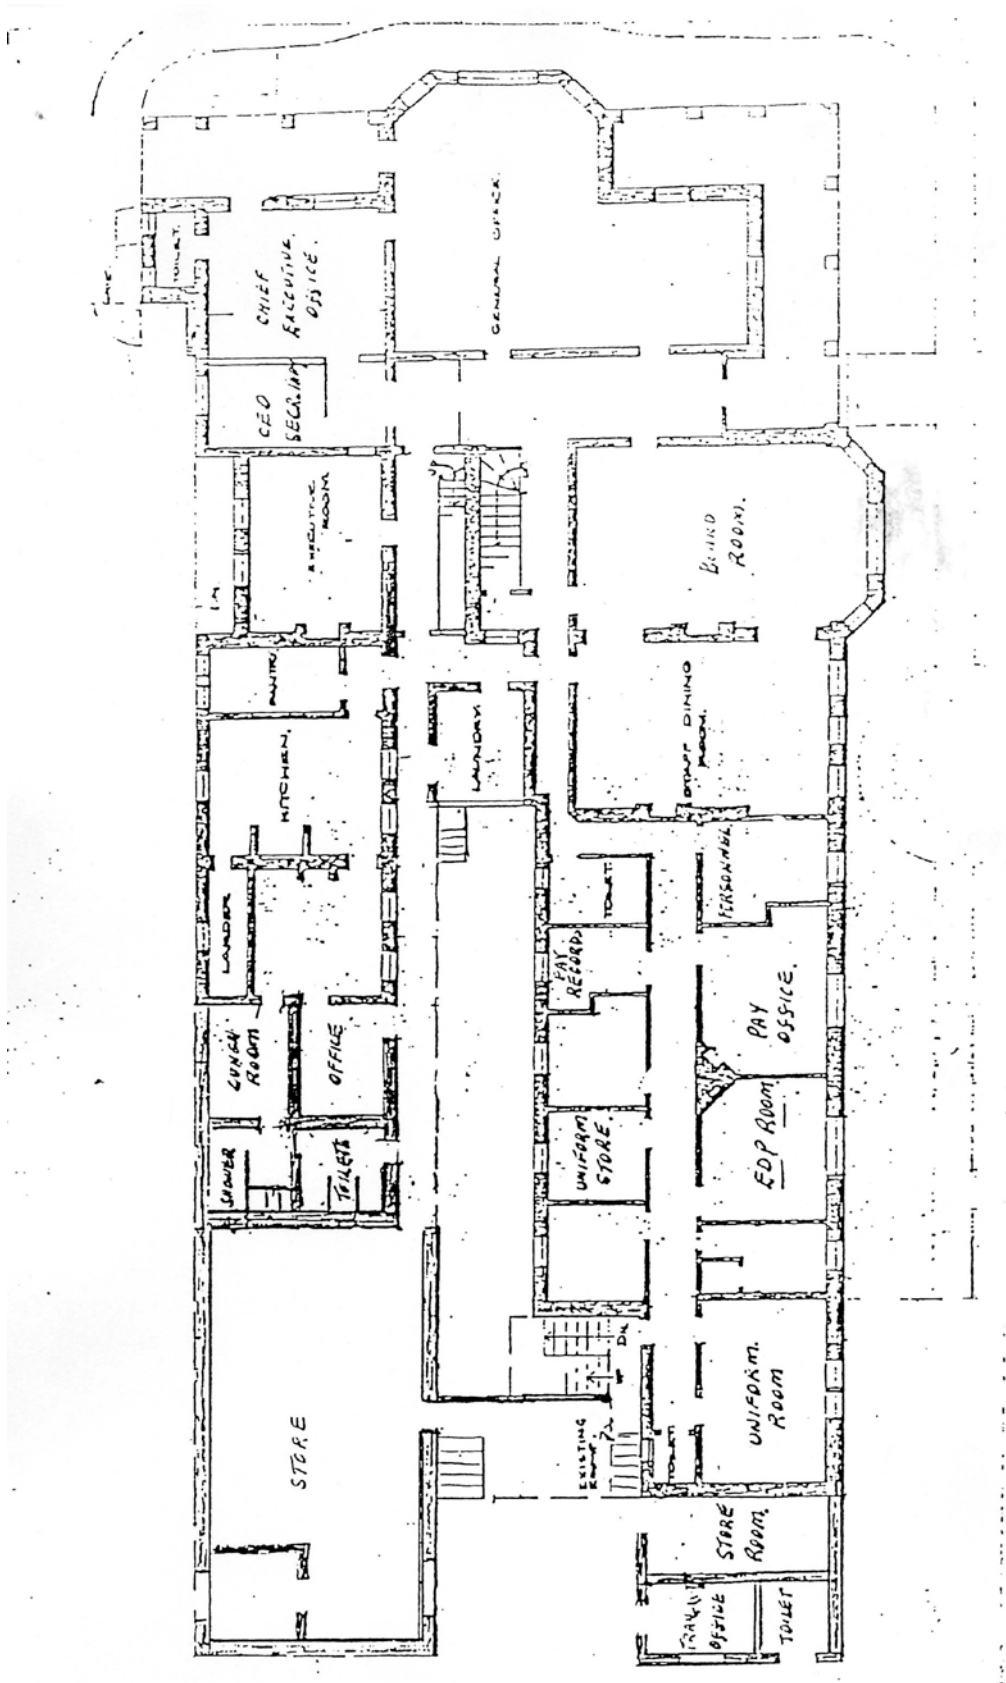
Ground floor plan of Airlie, showing the occupation by the Royal District Nursing Society, c.1957.
